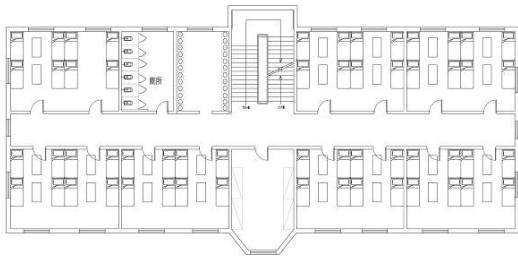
FIGURE IX. STANDARD FLOOR PLAN OF EVANSTON HALL
